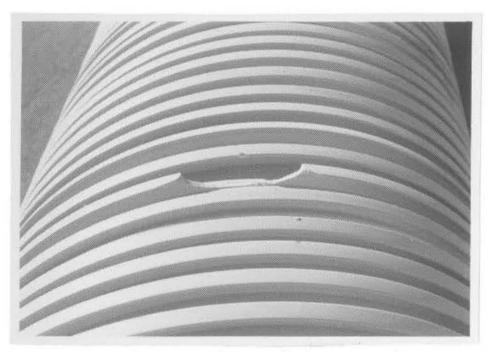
21" JM PVC Sewer Pipe. Pipe was easily chipped if mishandled.
